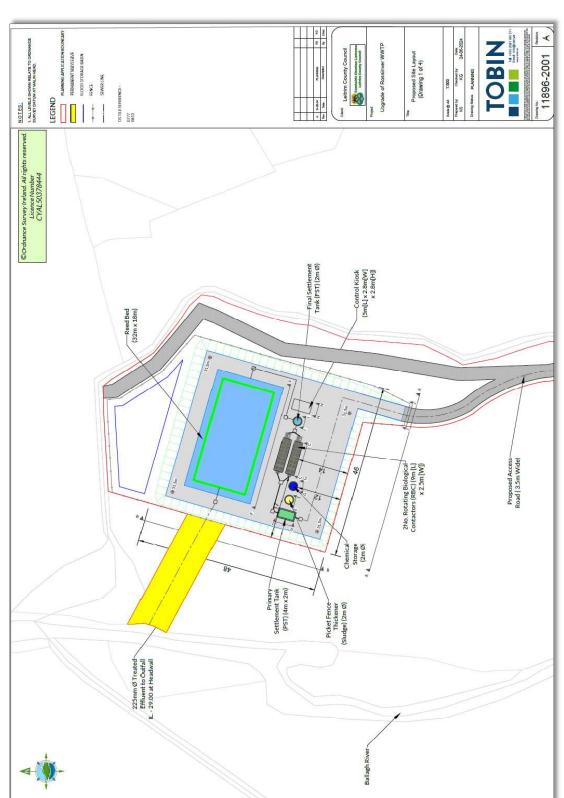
Wastewater Treatment Plant with outfall pipe and flood compensation storage area (not to scale), see planning drawing ref 11896 2002.
